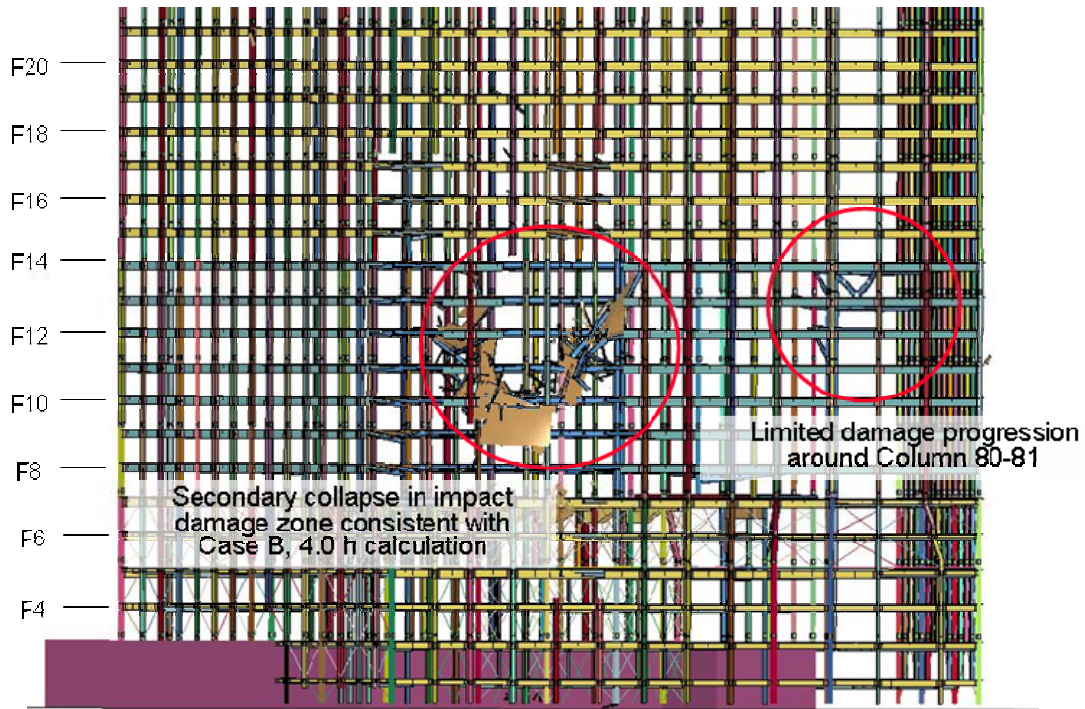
Lower floor damage in stable structure at -3.8 s (12.2 s). View from southwest.
